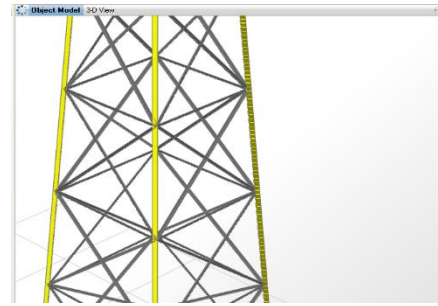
3D VIEW OF TOWER ANGLE SECTION
